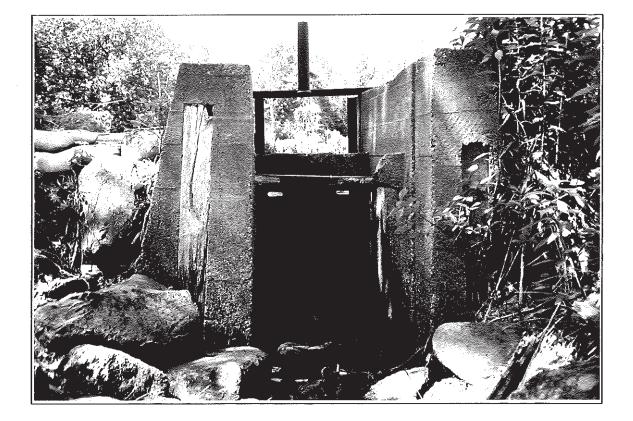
Lily Pond Dam. Downstream View of Sluiceway Structure.
